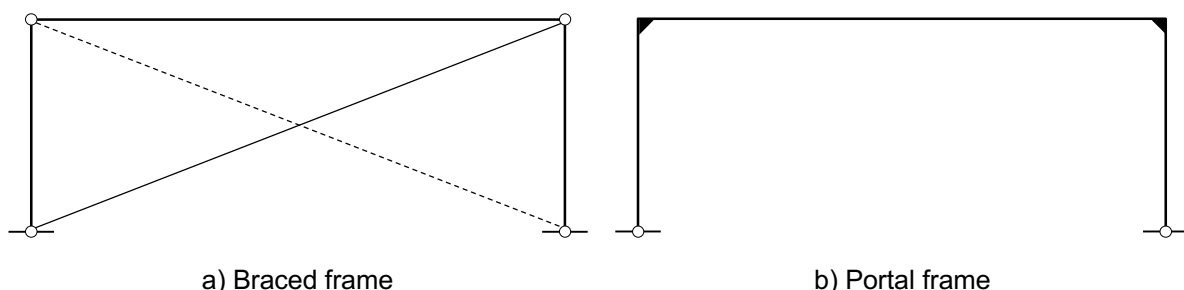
Framing schemes, e.g. single bay flat roof frame
